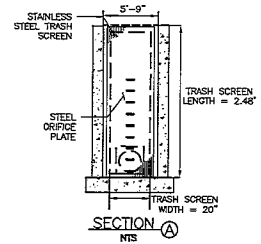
TYPICAL OUTLET STRUCTURE WITH WELL-SCREEN TRASH RACK
